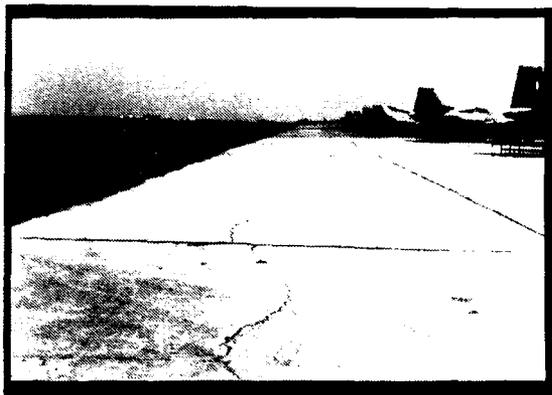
Typical longitudinal cracks extending the entire length of the apron. Recommend the cracks be cleaned and sealed.
